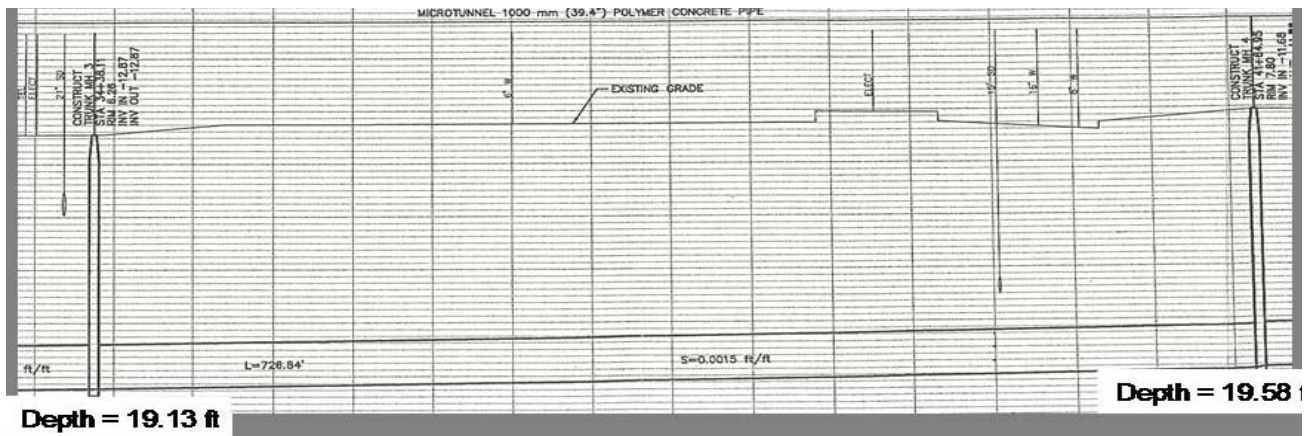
Alvarado Boulevard Trunk Sewer – Profile of Drive from Jacking Pit 3 to Reception Pit 4 (Calderwood, 2004).
